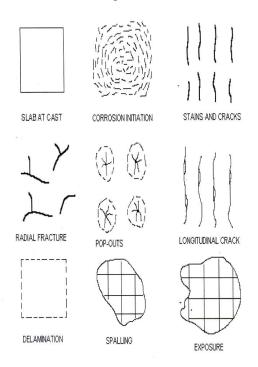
Typical Symptoms of Corrosion in a Reinforced Concrete Slab
